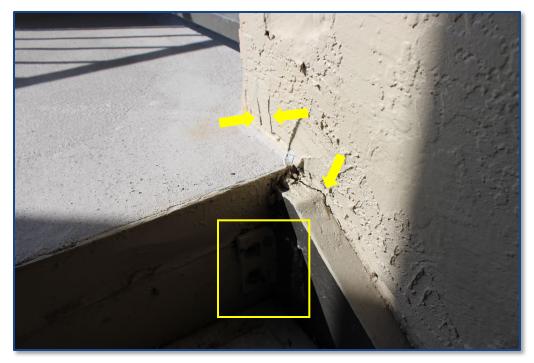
Crack in the stairway landing in the southeast stairway.
